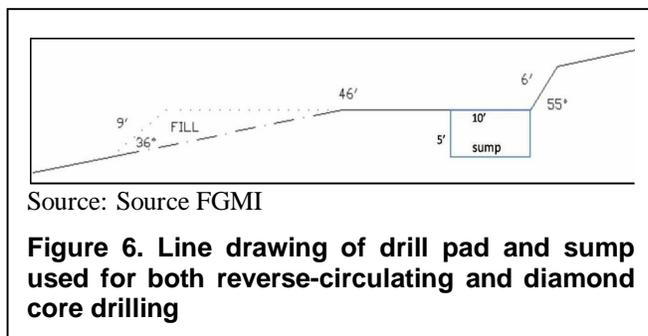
Line drawing of drill pad and sump used for both reverse-circulating and diamond core drilling
